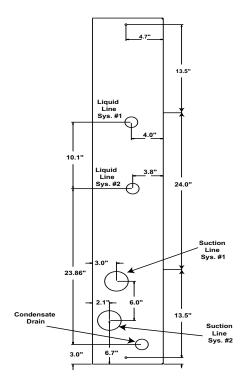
LB600 PIPING CONNECTIONS DETAIL
